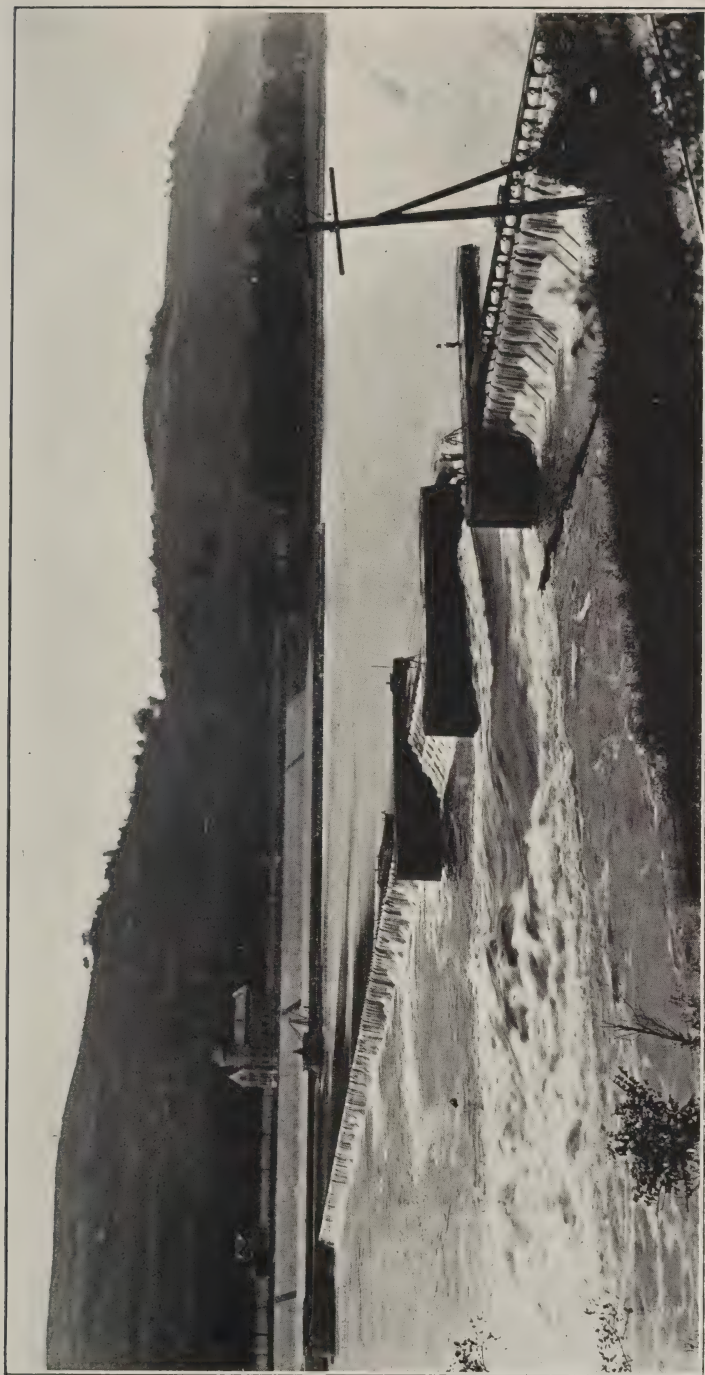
General view of Lock and Dam No. 11, Ohio River. Chanoine Weir with service bridge in immediate foreground, then two standard bear-traps with piers, navigable pass and lock. Power-house and two lock-keeper's houses on far shore. Later dams will have in addition a power-house in the river wall to use water power.
